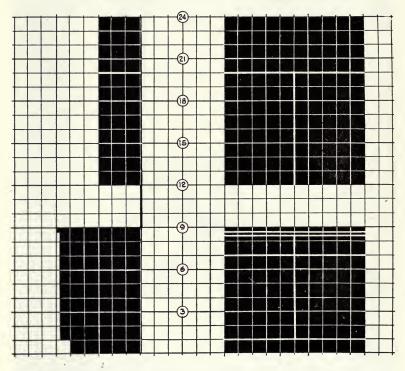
Side and front views of wall cabinets blocked out in 4-inch modules.
